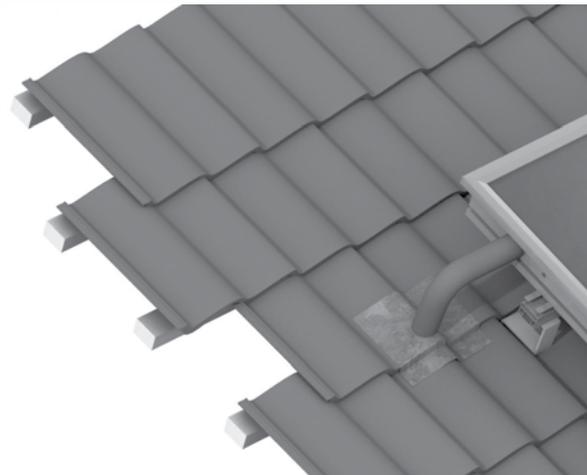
Detail View of Solar Collector Field Connection - On-Roof Systems
